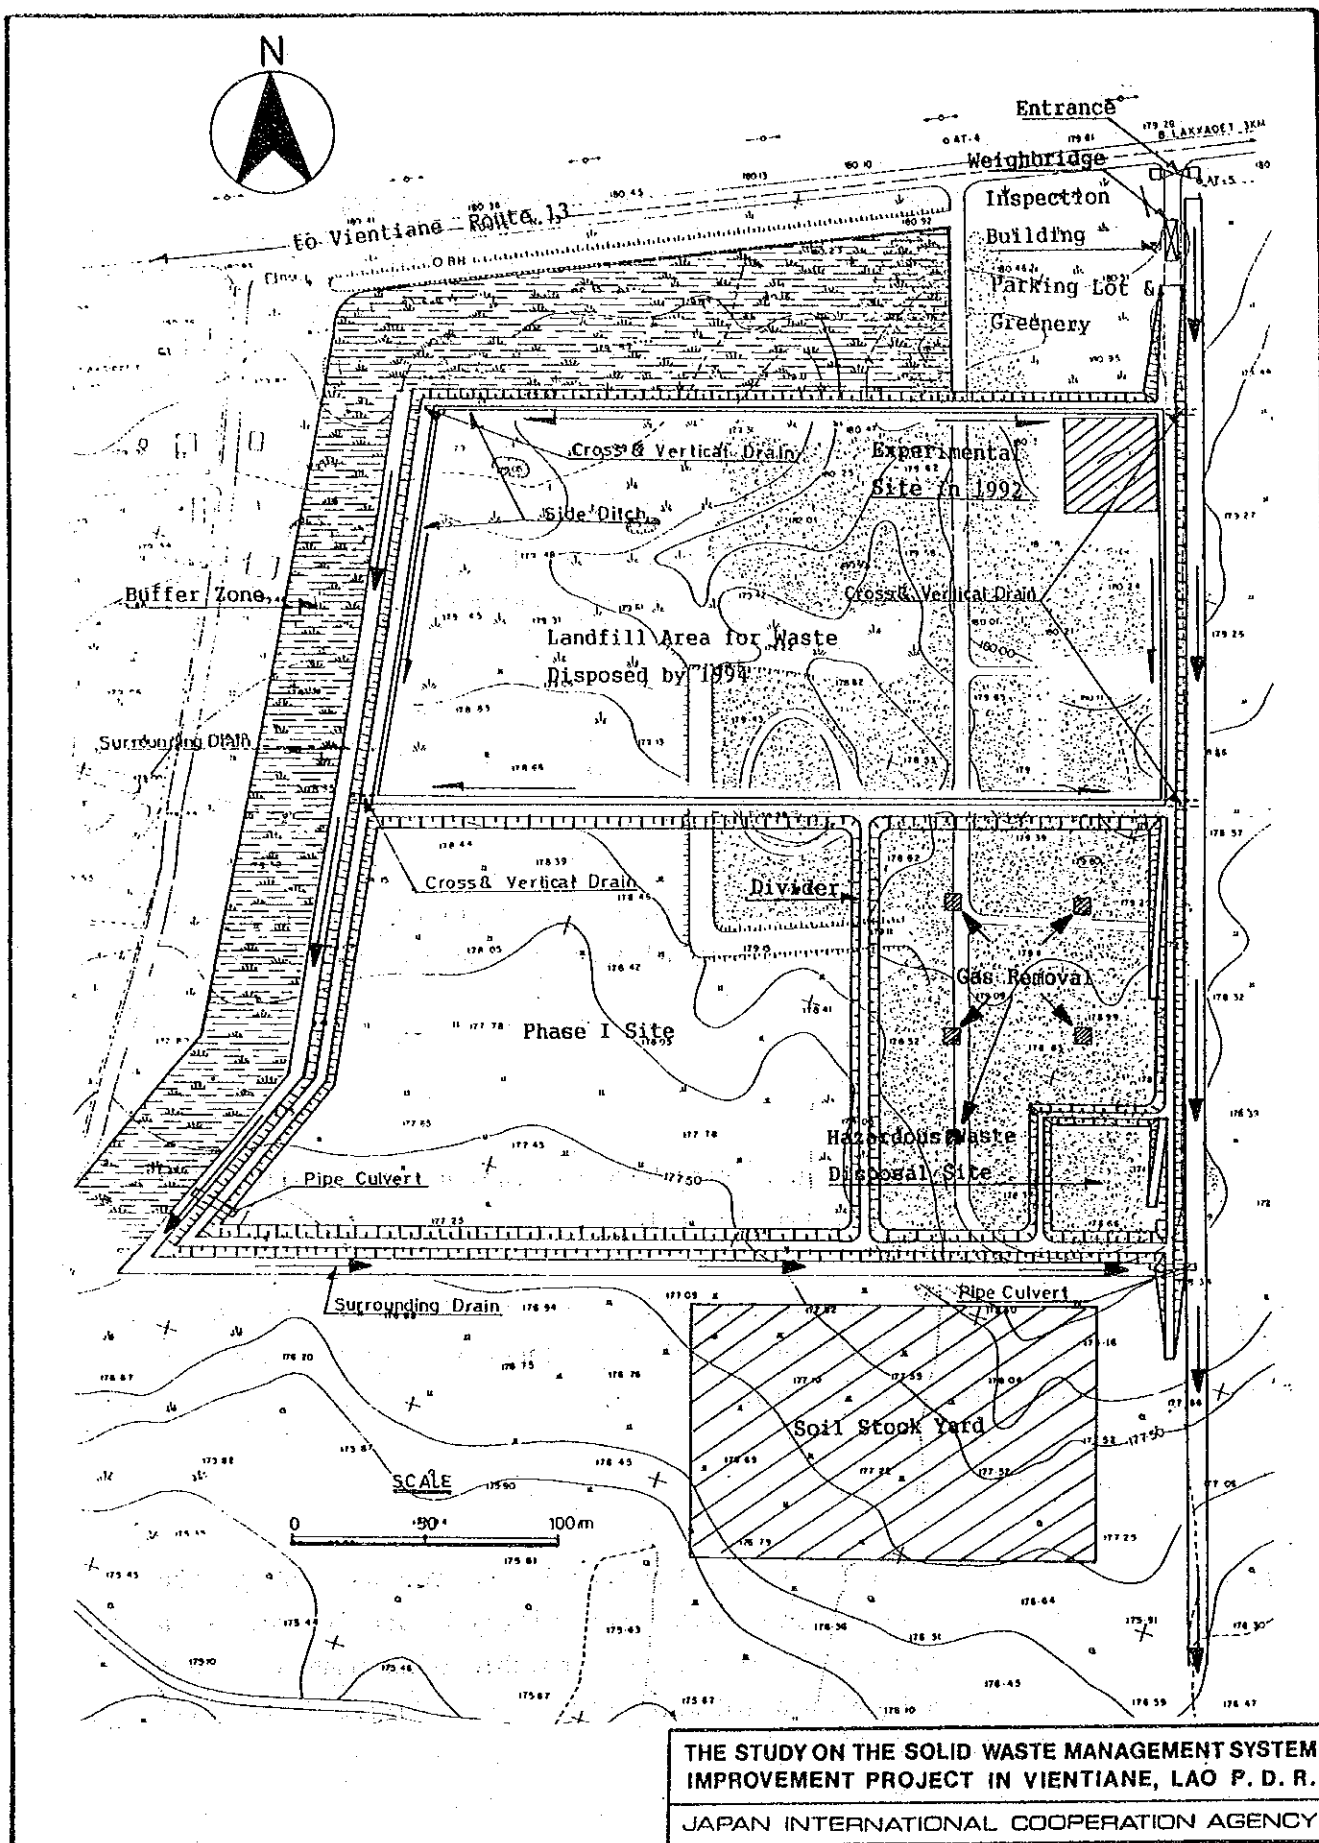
Proposed Drainage System at KM 18-DS
